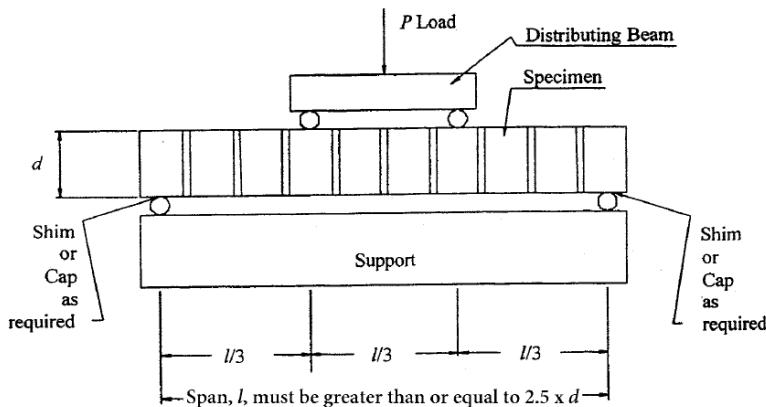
Third-Point loading test (ASTM E518, 2010).
